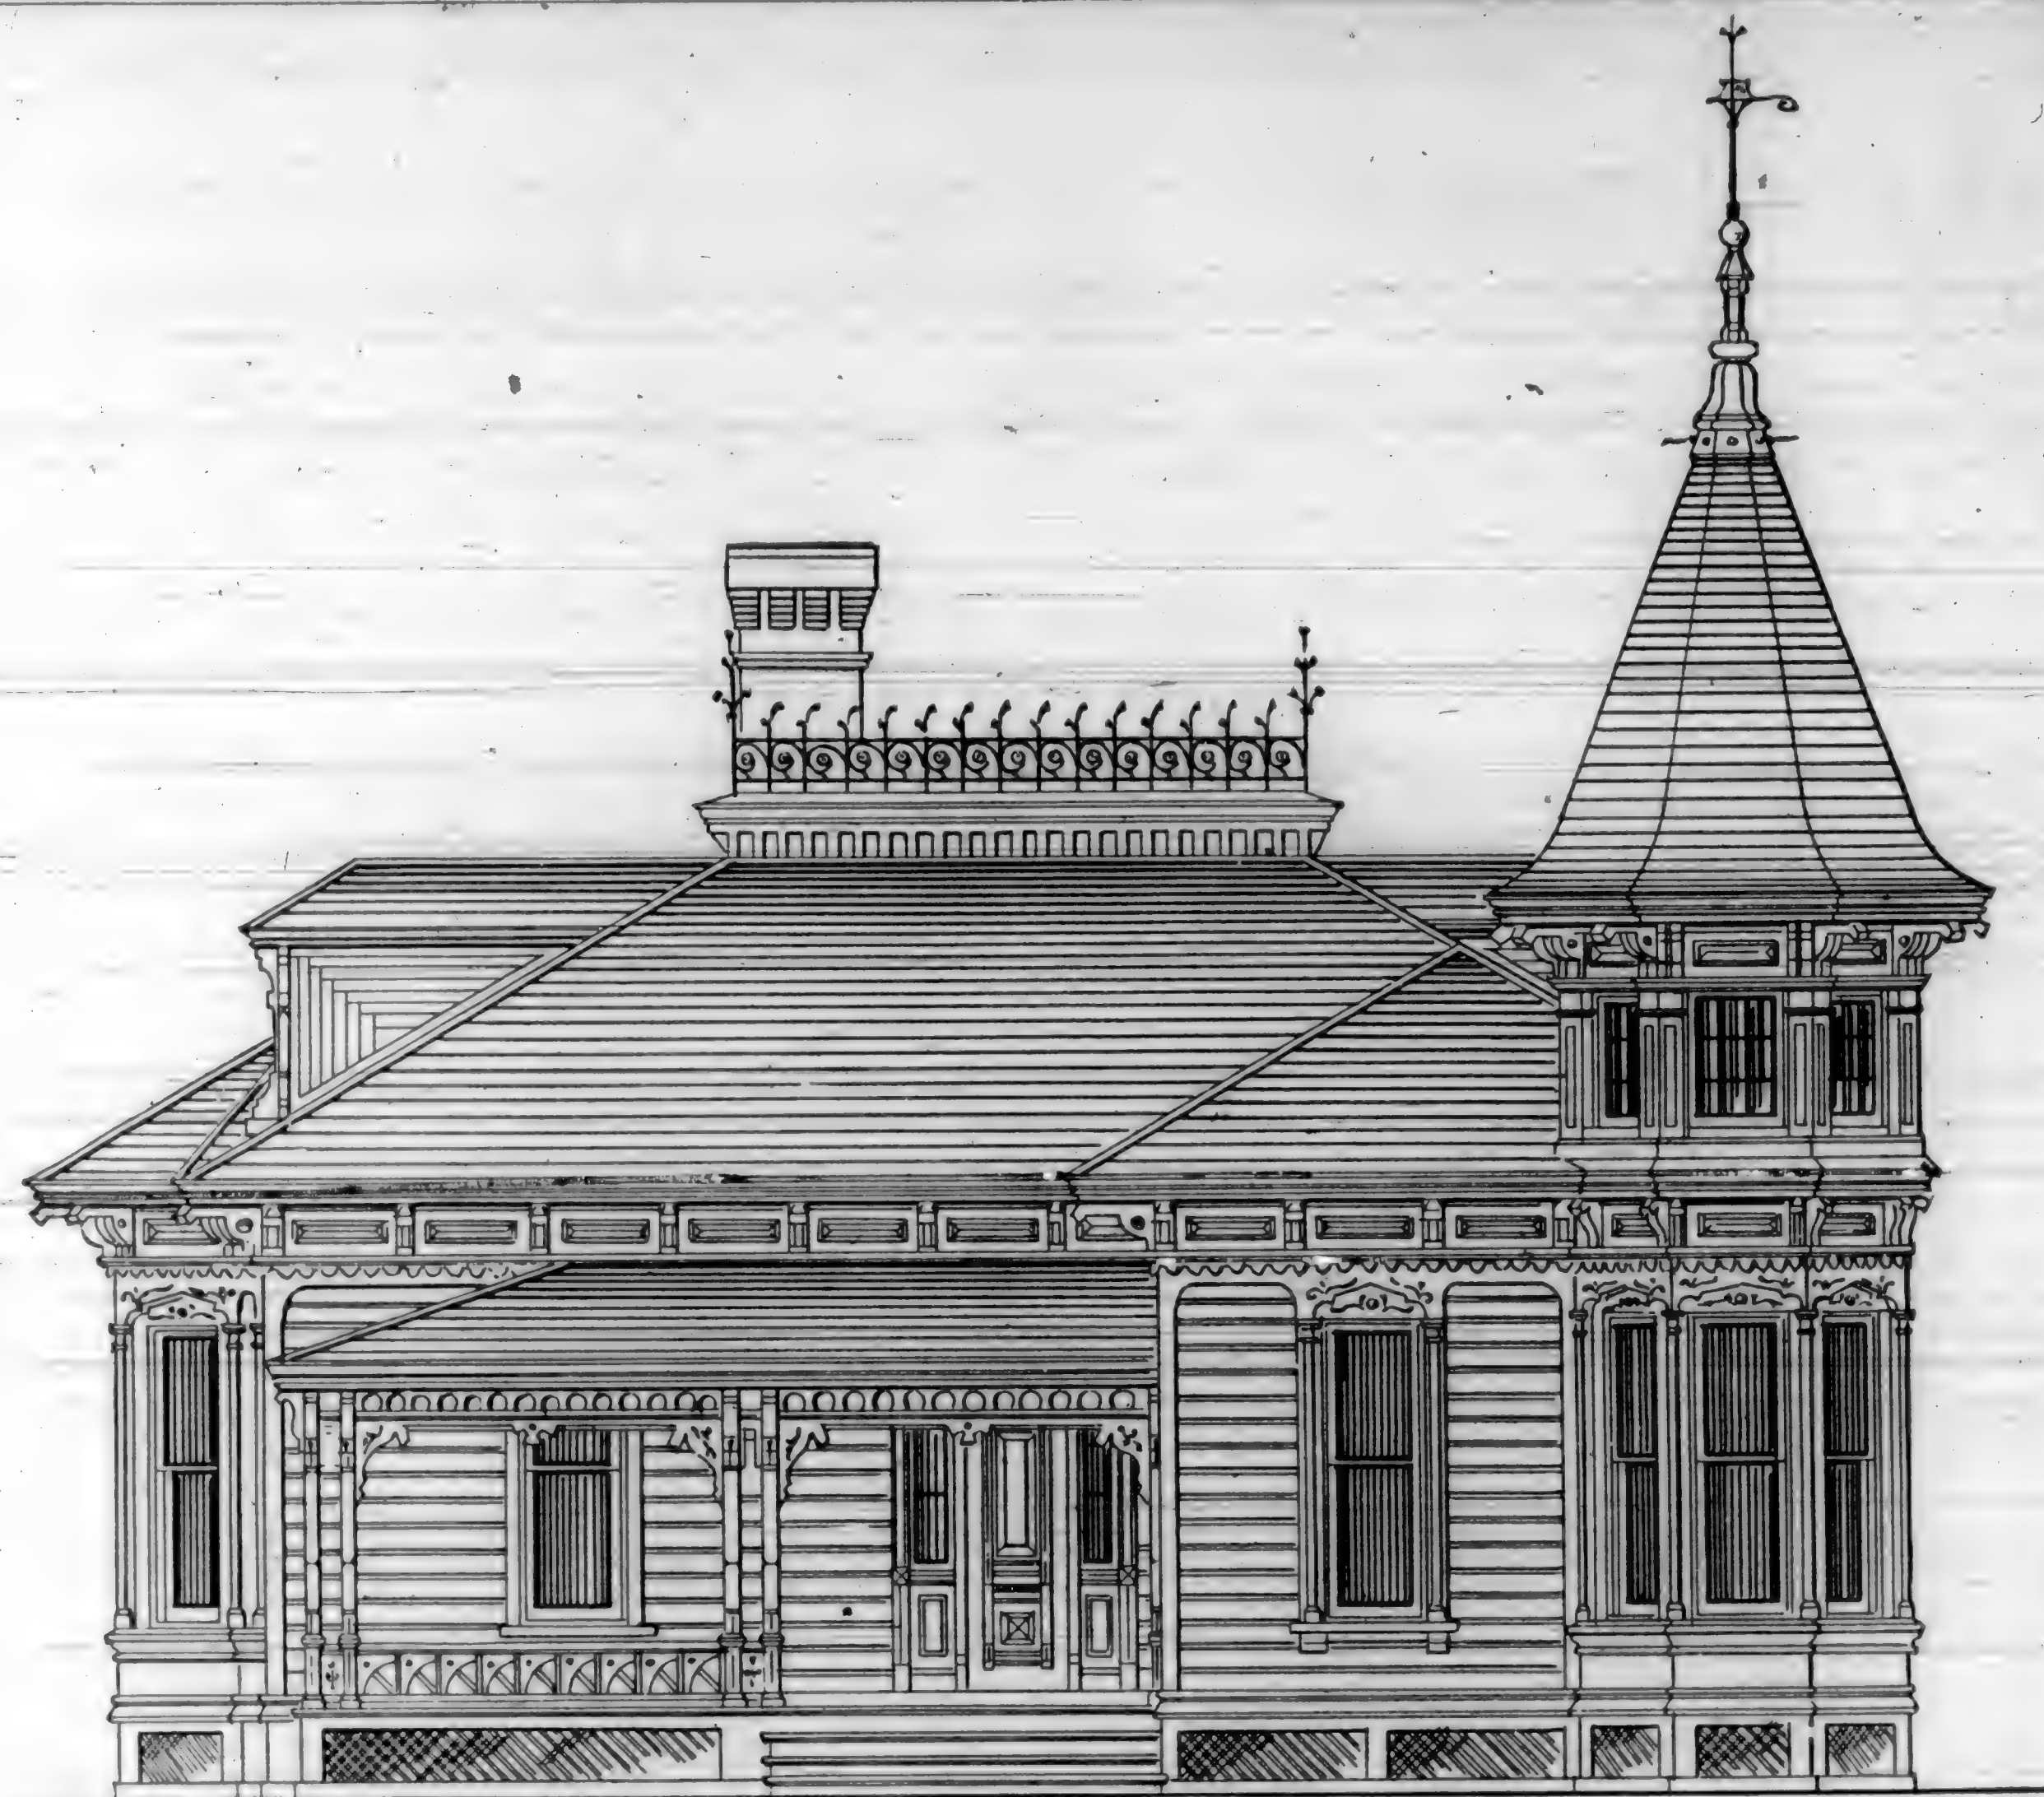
FRONT ELEVATION OF COUNTRY DWELLING COSTING ABOUT \$3,500.
